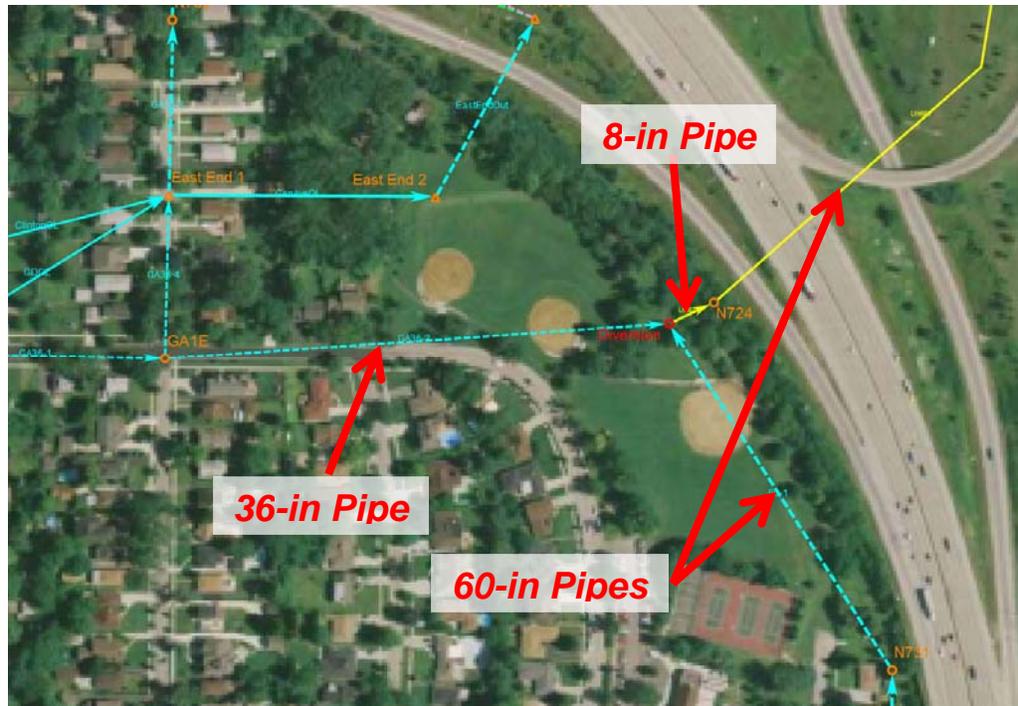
Plan View of EE Site in the CFP NCalCritical Existing Model
